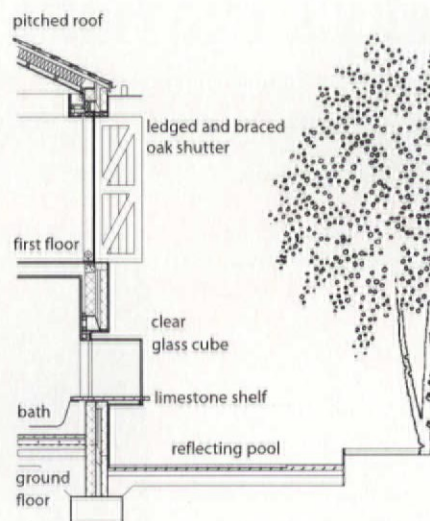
DETAIL SECTION THROUGH WALL AND GLASS CUBE
